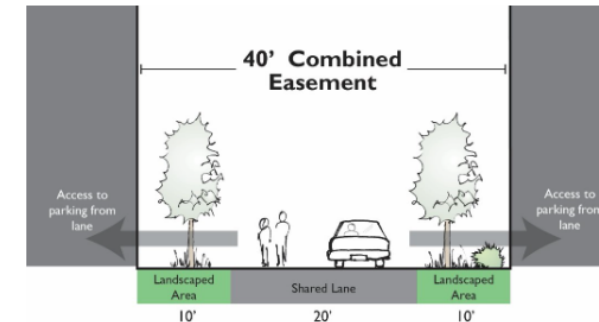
E.2. Streetscape cross-section for other streetscapes when featuring a stoop or landscaped setback.
